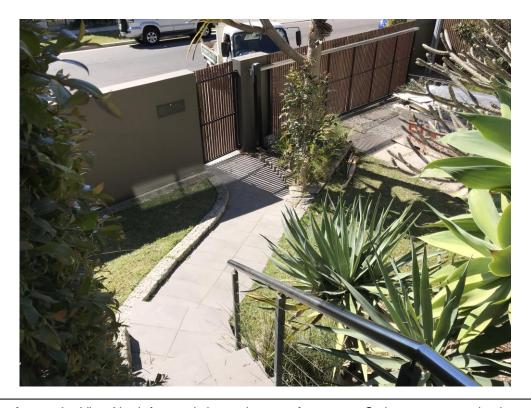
View North from existing stairs up to front entry. Stairs are proposed to be removed, reoriented, and replaced with new in altered location to fit with proposed upgrade of front garden. Significant planting to be retained with additional planting as required.
